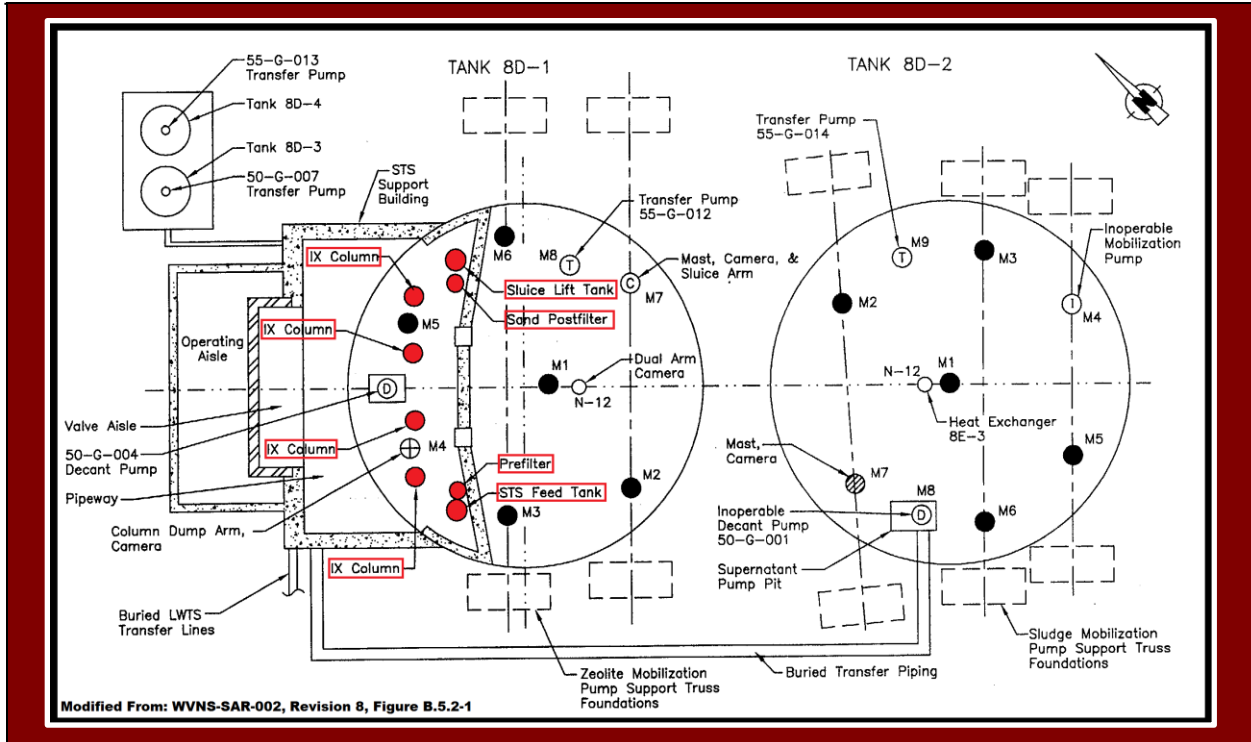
Plan View of STS Equipment in Tank 8D-1
